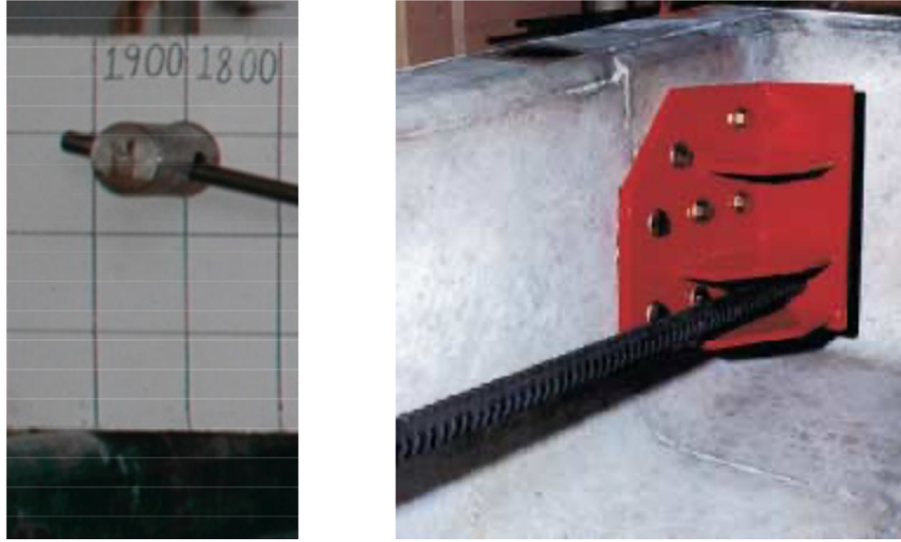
Anchor pins and steel bracket anchorage systems (Lee et al., 2018) (Sayed-Ahmed et al., 2004)
